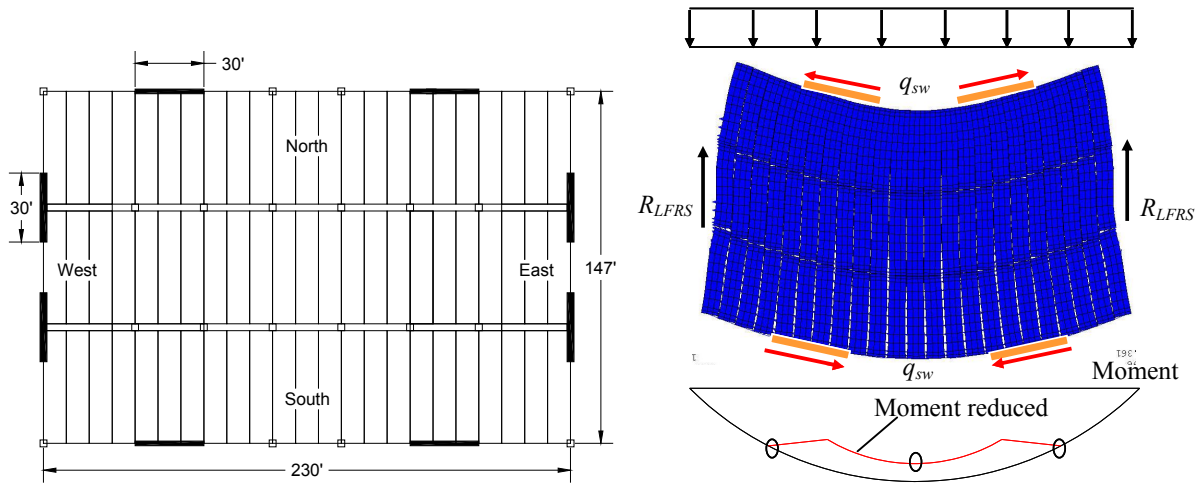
8-story parking garage with perimeter shear walls: (a) Plan; (b) FBD.
